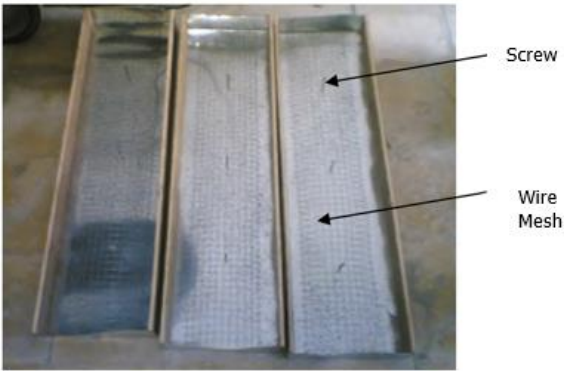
Installation of wire mesh and screws on ferrocement test molds.
